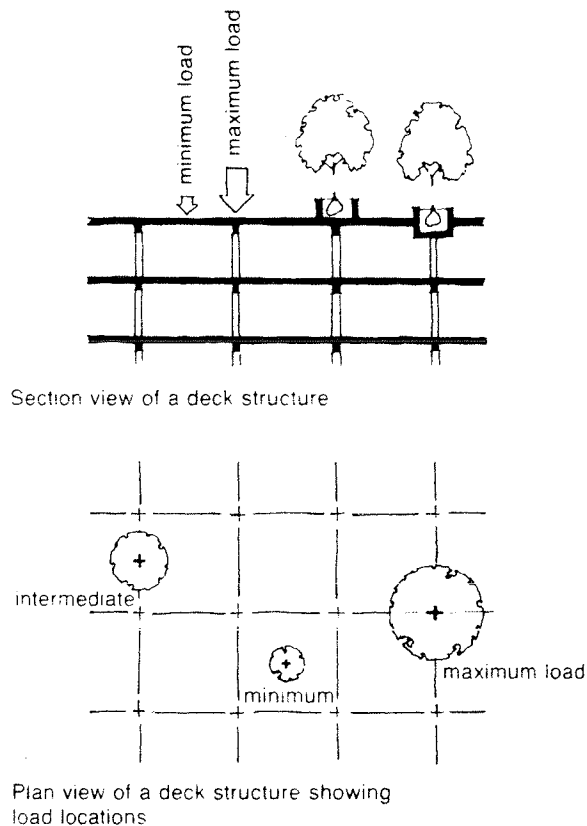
Locating Concentrated Loads over Structural Supports (From "Roof Decks Design Guidelines," 1979.)
